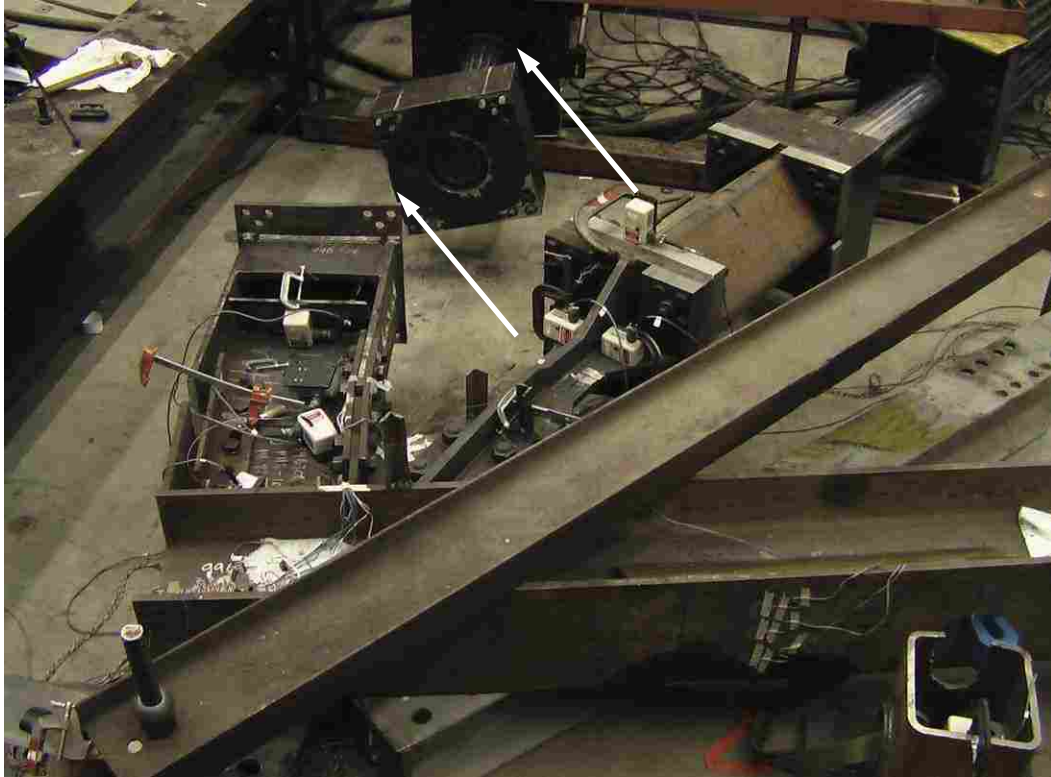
Specimen 1 – Bolt Failure at Boundary Plate
